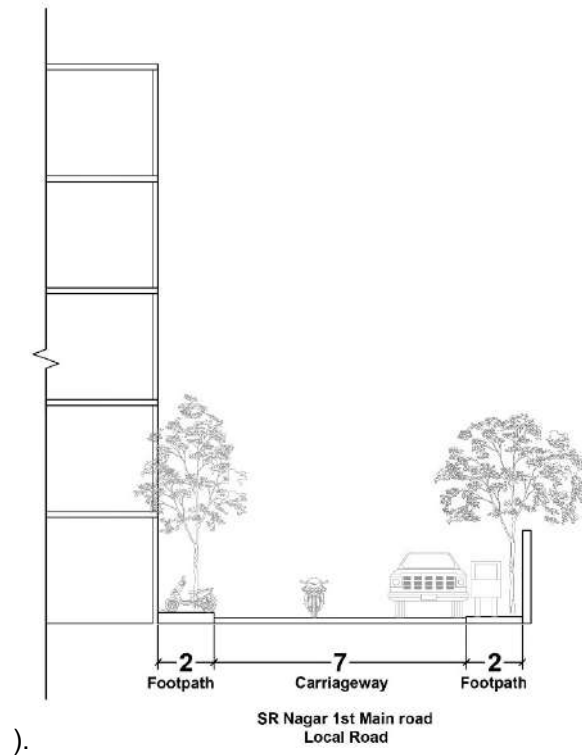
Cross section of SR Nagar 1st Main Road (H – H')
